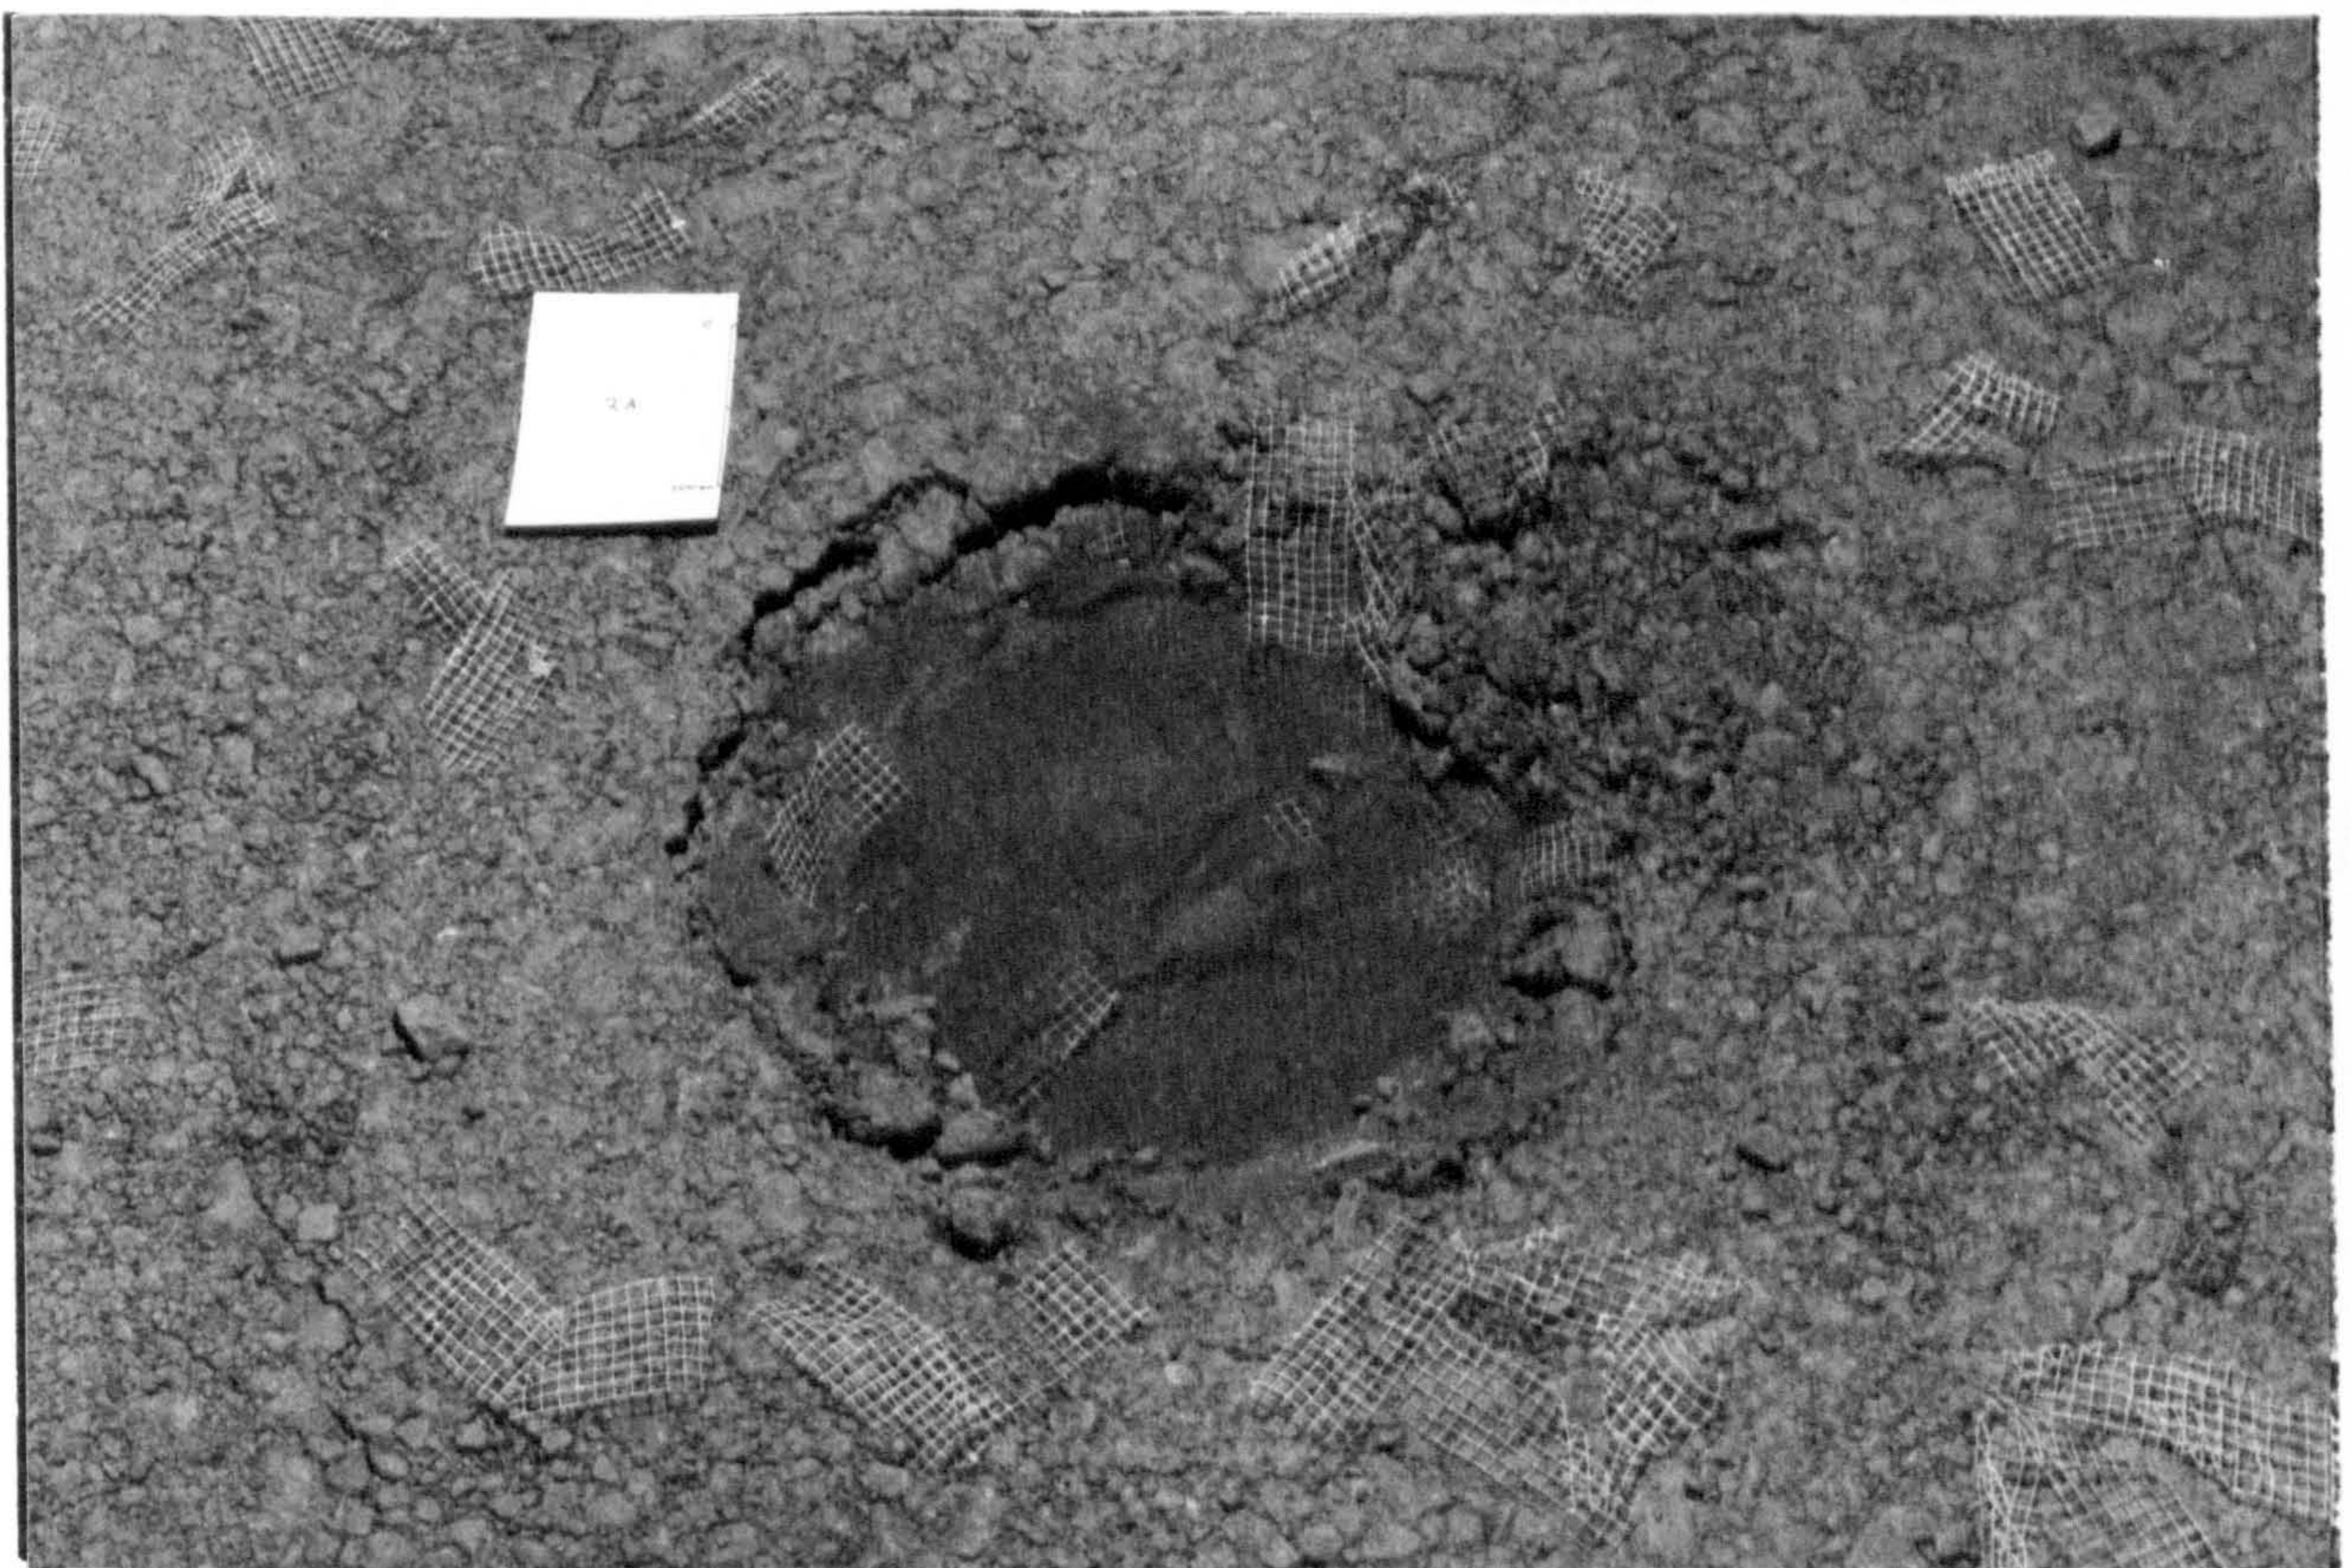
300 mm Diameter Hole After Plate-Load Bearing Tests on Aggregate
